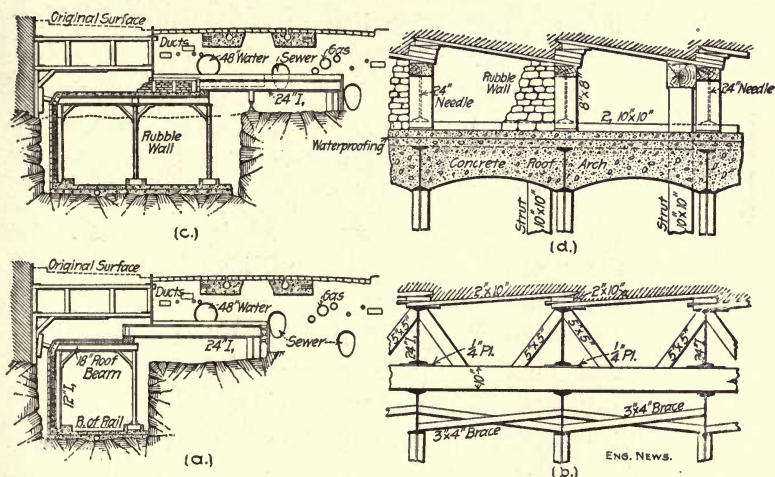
New York Subway: Sketch-plan Showing Method of Work Between Fifth and Sixth Avenues.
